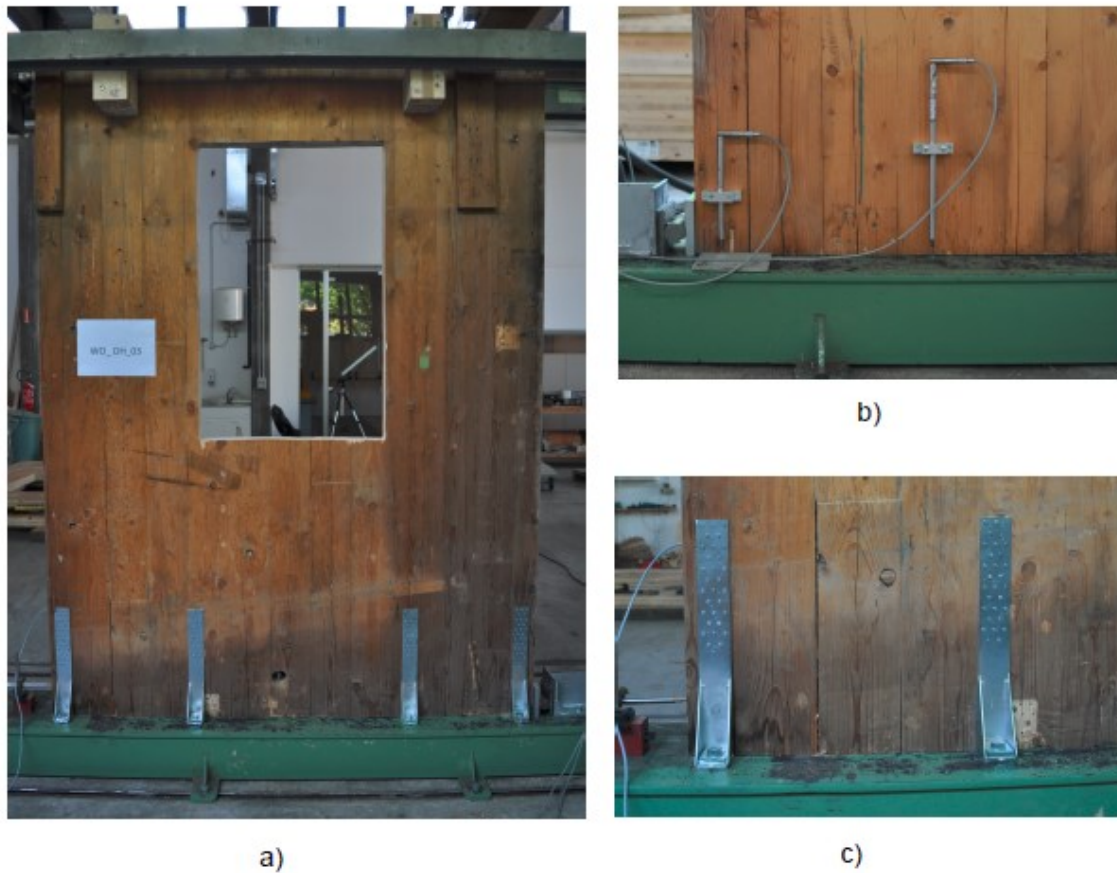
Geometric configuration, connection system and monitored displacements of shearwall 03, a) picture of the wall, b) LVDTs placed at the left side of the wall and, c) zoom in of WHT440 hold-down connection at the right side of the wall
